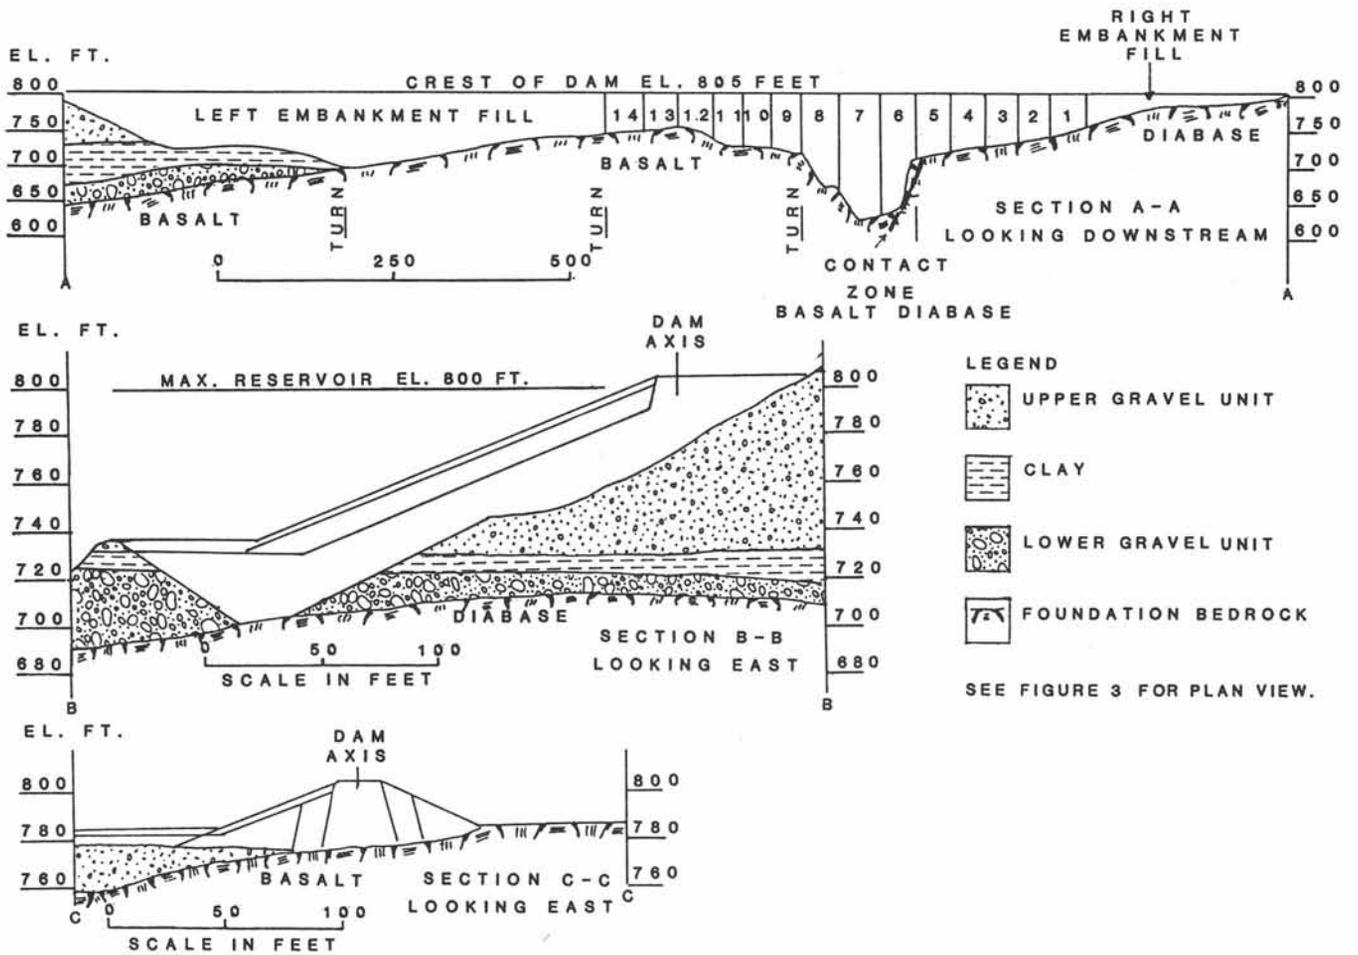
Geologic sections of Wynoochee Dam. A-A, section along dam axis; view downstream. B-B, section normal to axis through the left embankment and cut-off trench. C-C, section normal to the axis through the right embankment. See Figure 3 for section locations.
